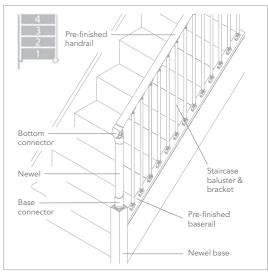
Bottom flight - Fusion straight with bullnose step
